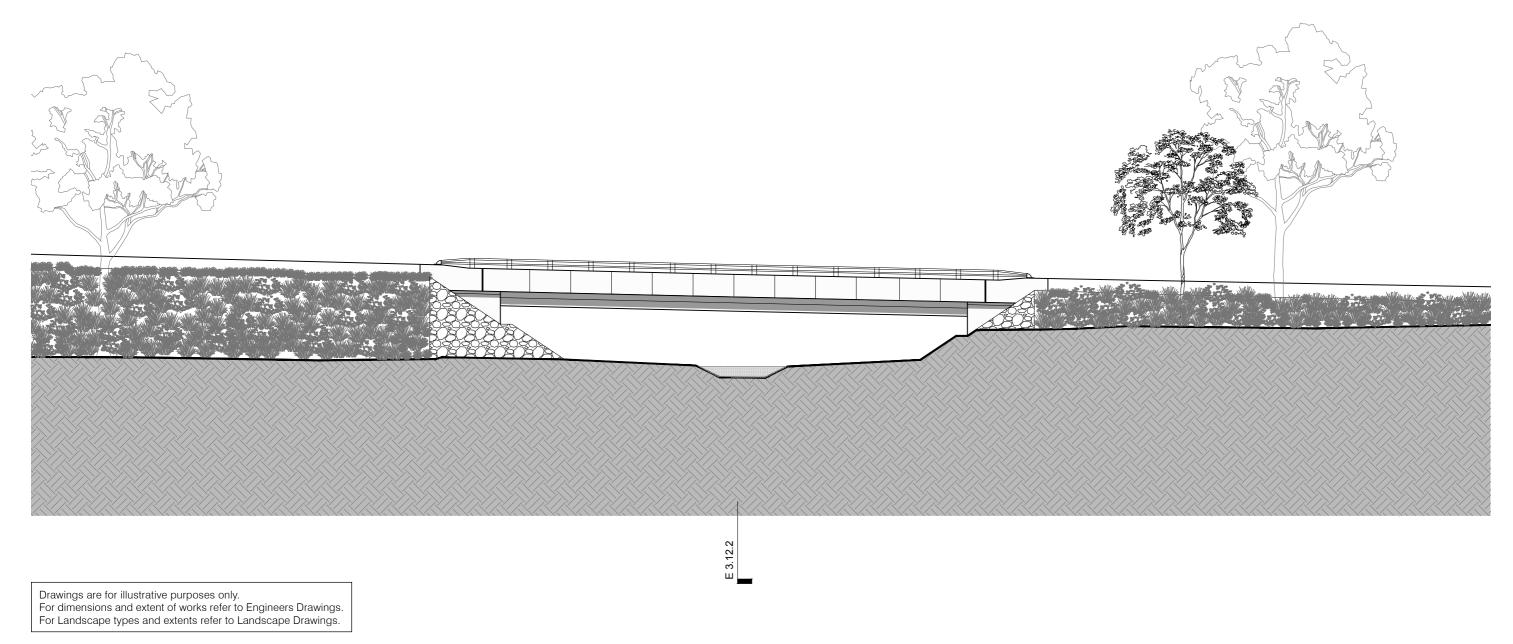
Northbound Bridge over Fauna Crossing: Elevation
